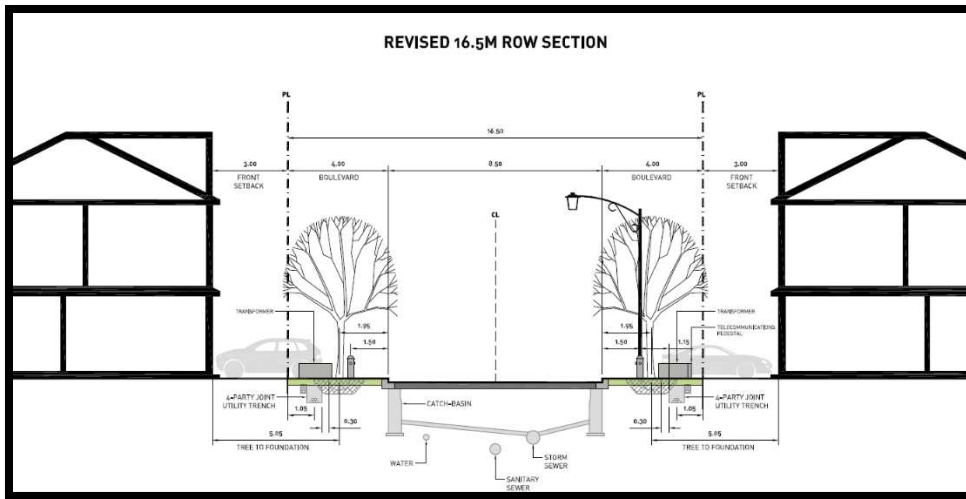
16.5 m Local Road ROW for 2275 Mer Bleue Road
